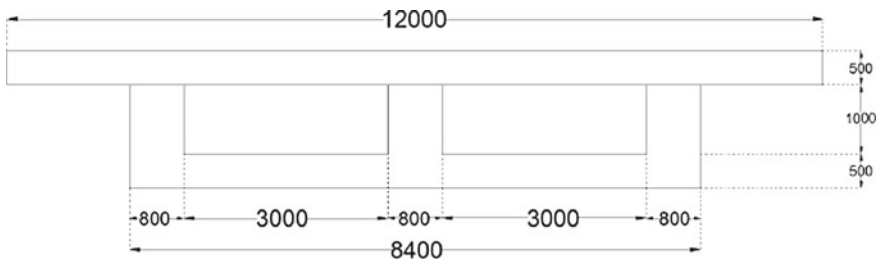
Cross-sectional geometry of the full-scale structure considered (dimensions in mm)
